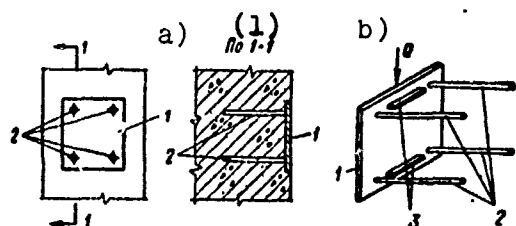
The structure of steel insert components consisting of; a - a plate of four deformed anchor rods; b - the same, with the welding of additional thrust plates; 1 - an insert component (steel plate); 2 - the anchor rods T-welded; 3 - thrust plates. KEY: (1) According to.
